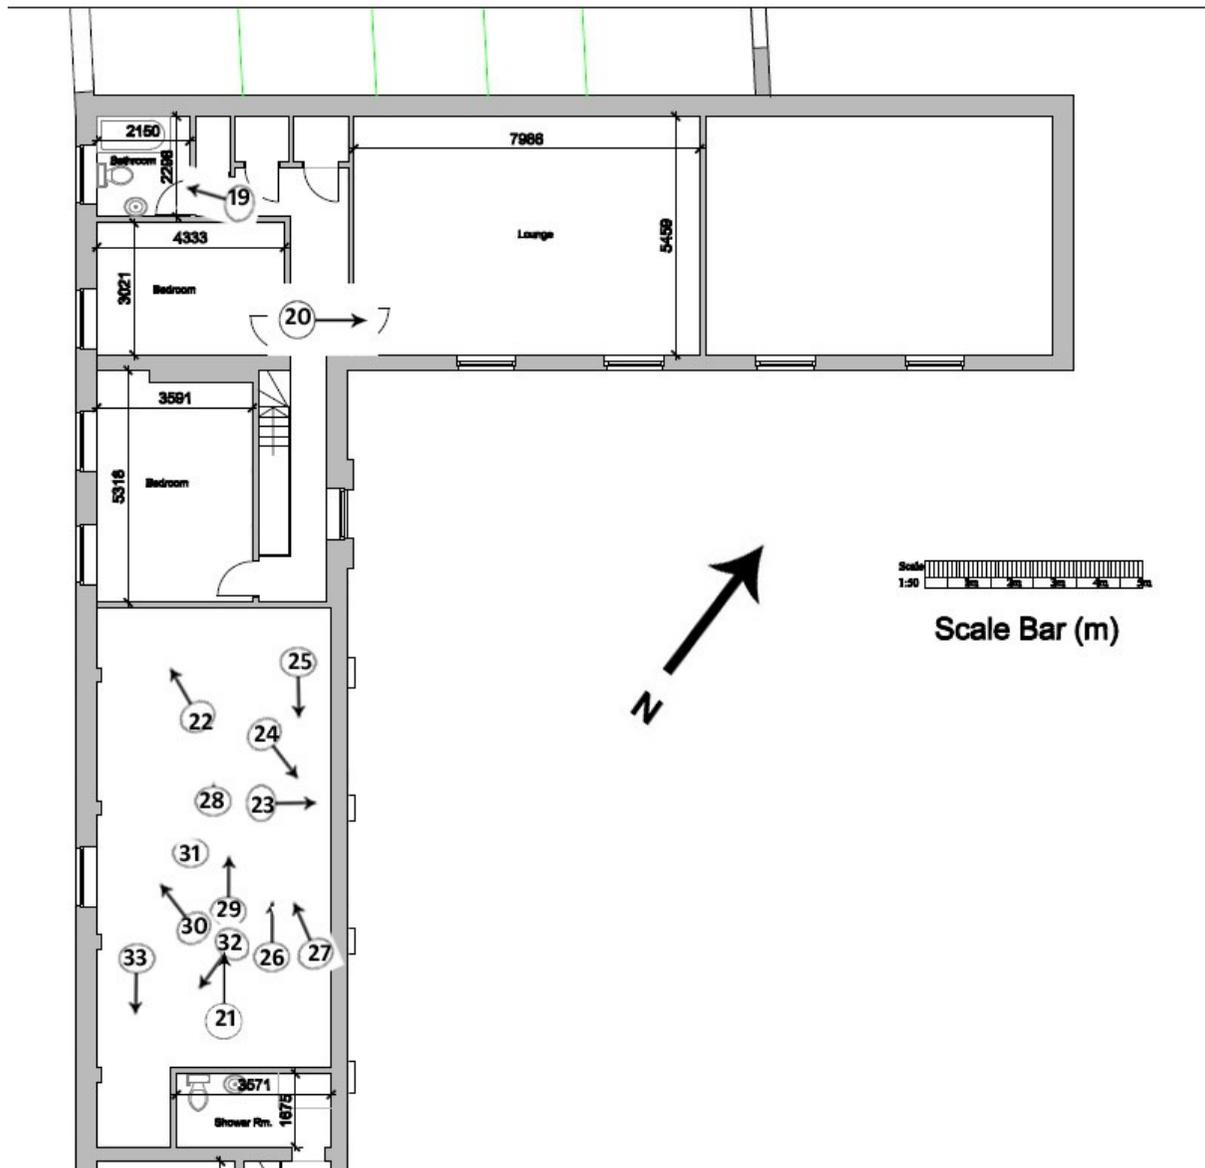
Ground floor plan and photograph locations based on architect's plan ©Glenn Moore Associates drawing number 1718/160/07.
